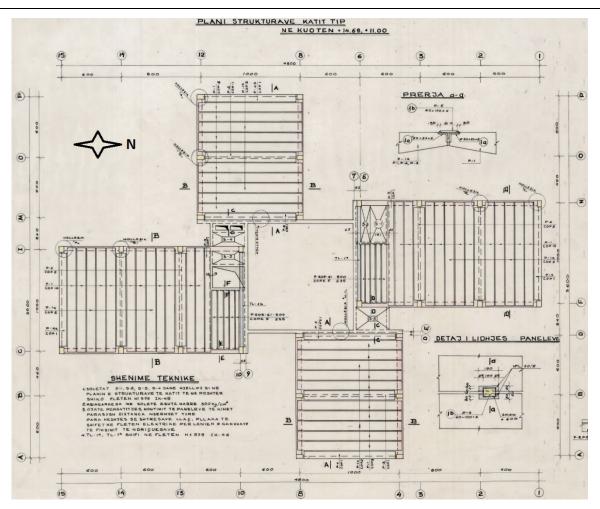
Structural layout of the FIN Building at the Polytechnic University of Tirana showing a masonry core (central block) and four PRCF blocks (source: Instituti i Studimeve Projektimit No. 4 – Plani Strukturave Katit Tip (1981)).
